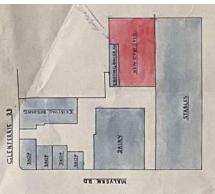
(L) Site plan for the corner building, proposed dairy building (centre) and stables, 1934 (SHC Ref No 11920)
